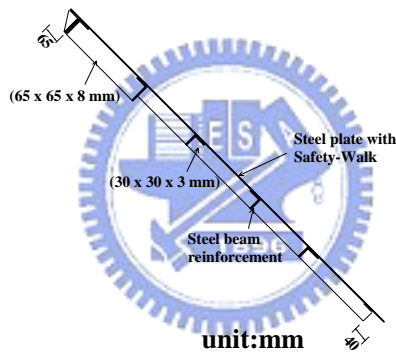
NCTU model retaining wall with inclined interface plate
